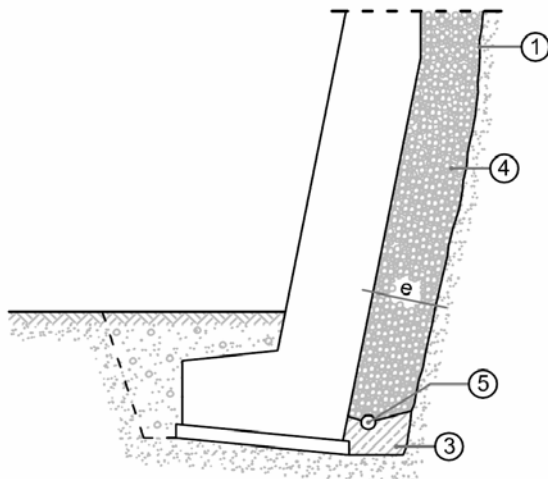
Execution of drainage by means of a packed rockfill or gravel balls (1 excavation, 3 filling concrete, 4 packed rockfill or gravel balls, 5 drainage pipe of  $d_{min} = 20$  cm)
